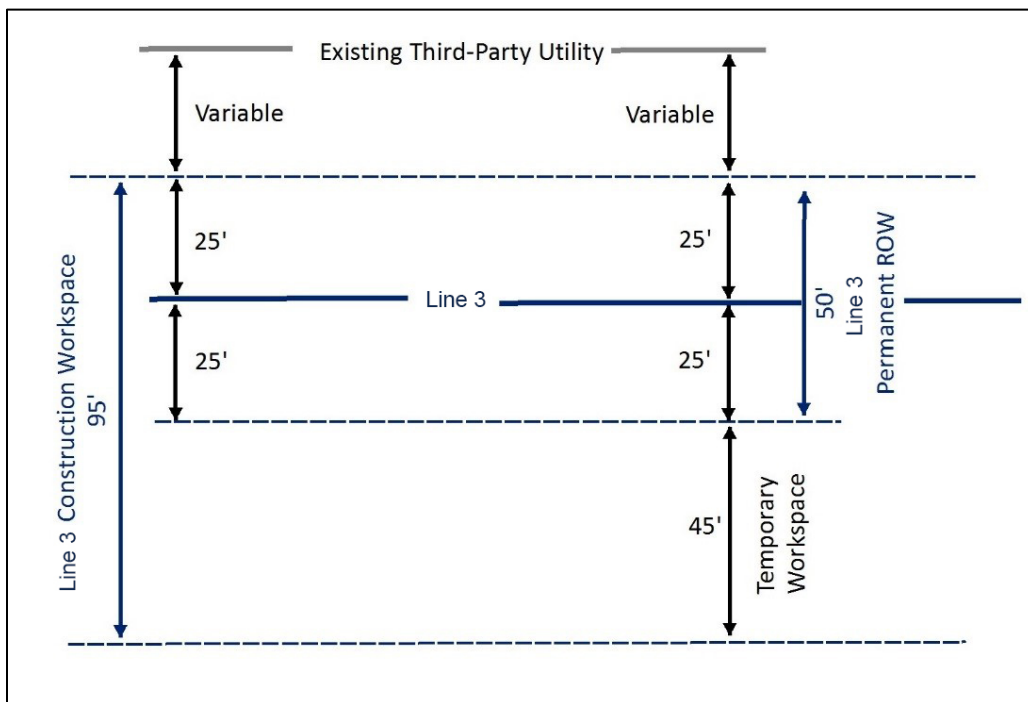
Plan View – Proposed Co-Location of the Proposed Line 3 Pipeline Right-of-Way with Existing Pipelines, Transmission Lines, and Highways in Wetlands
